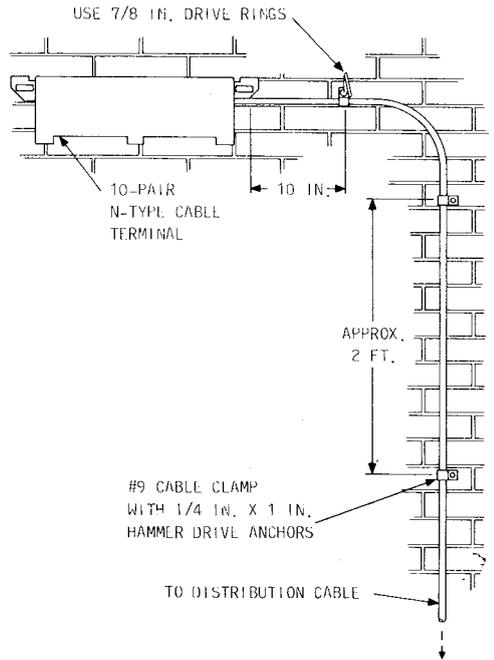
Horizontal-Mounted Terminal Above a Horizontal Cable Run
